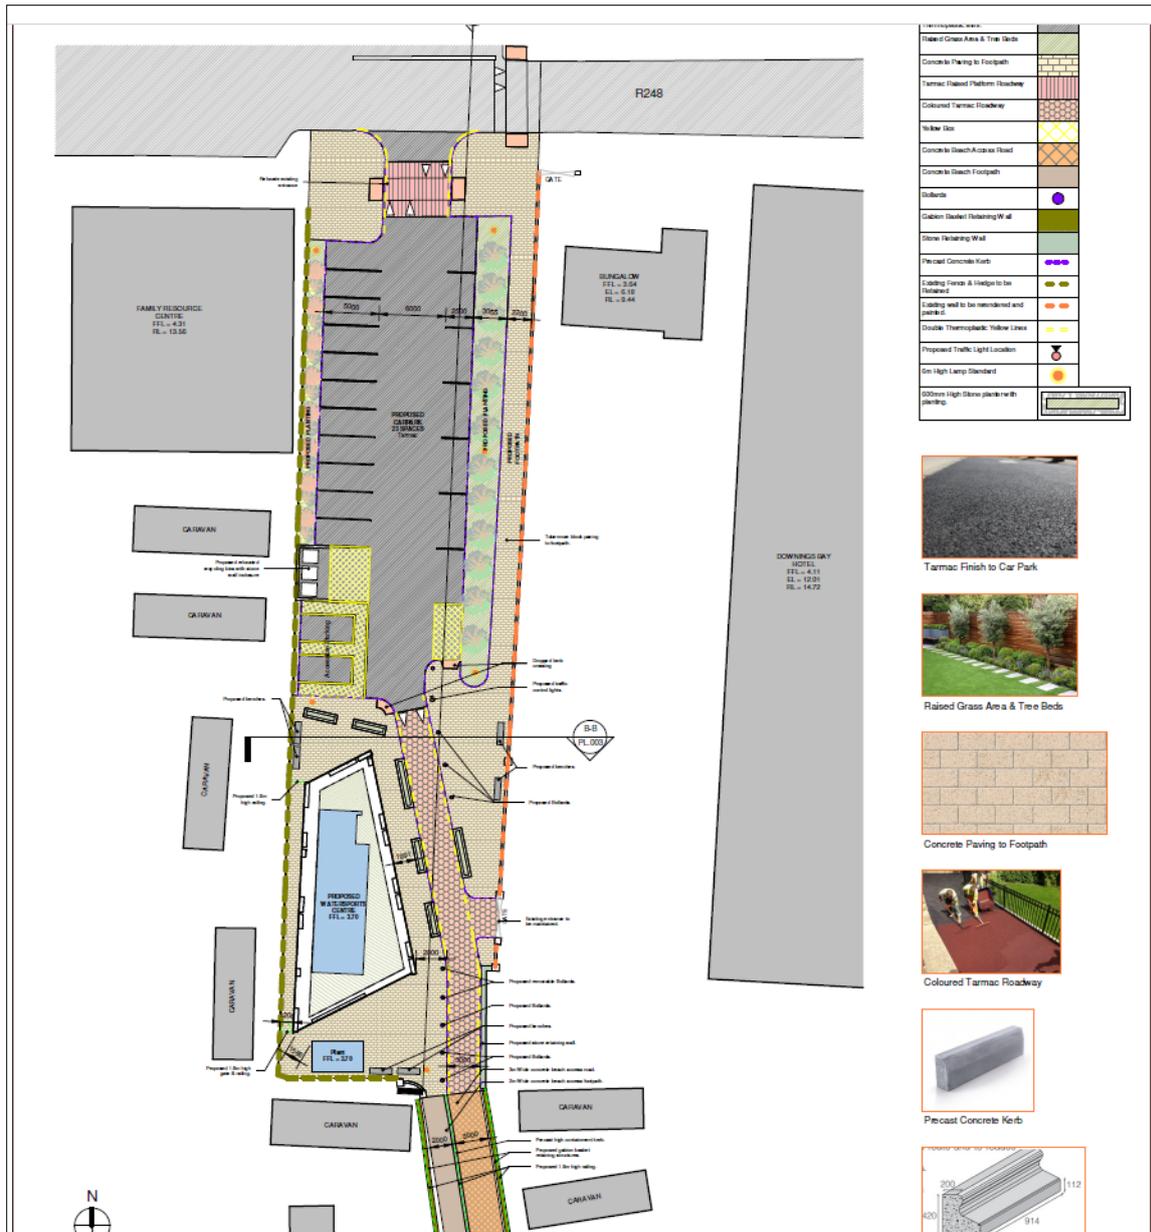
Platform for Growth: Downings extract from site layout plan, as supplied by Paul Doherty Architects Ltd. (Not to scale).
